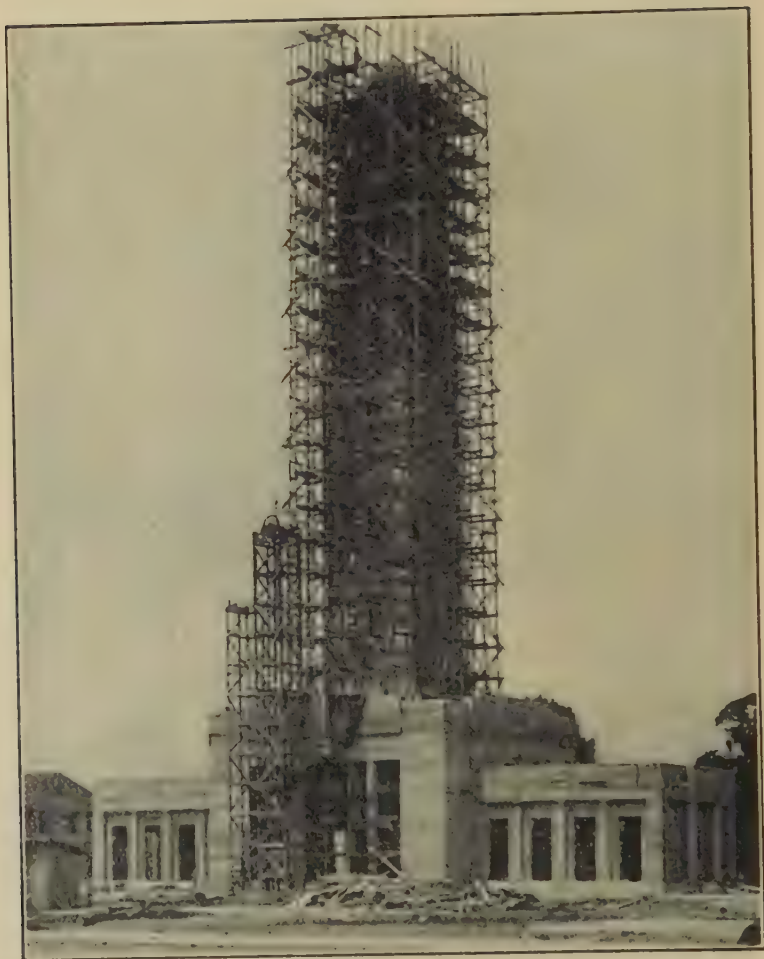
CAMPANILE UNDER CONSTRUCTION.
